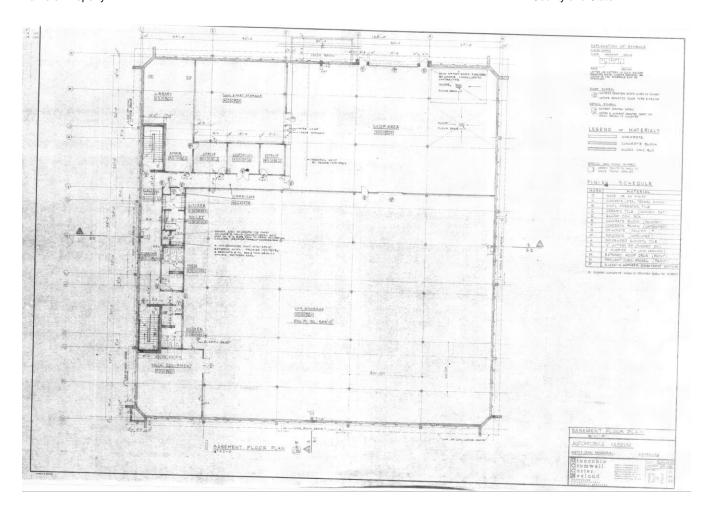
Basement floor plan for the Museum of Automobiles. From the files of the Arkansas Department of Parks and Tourism.
